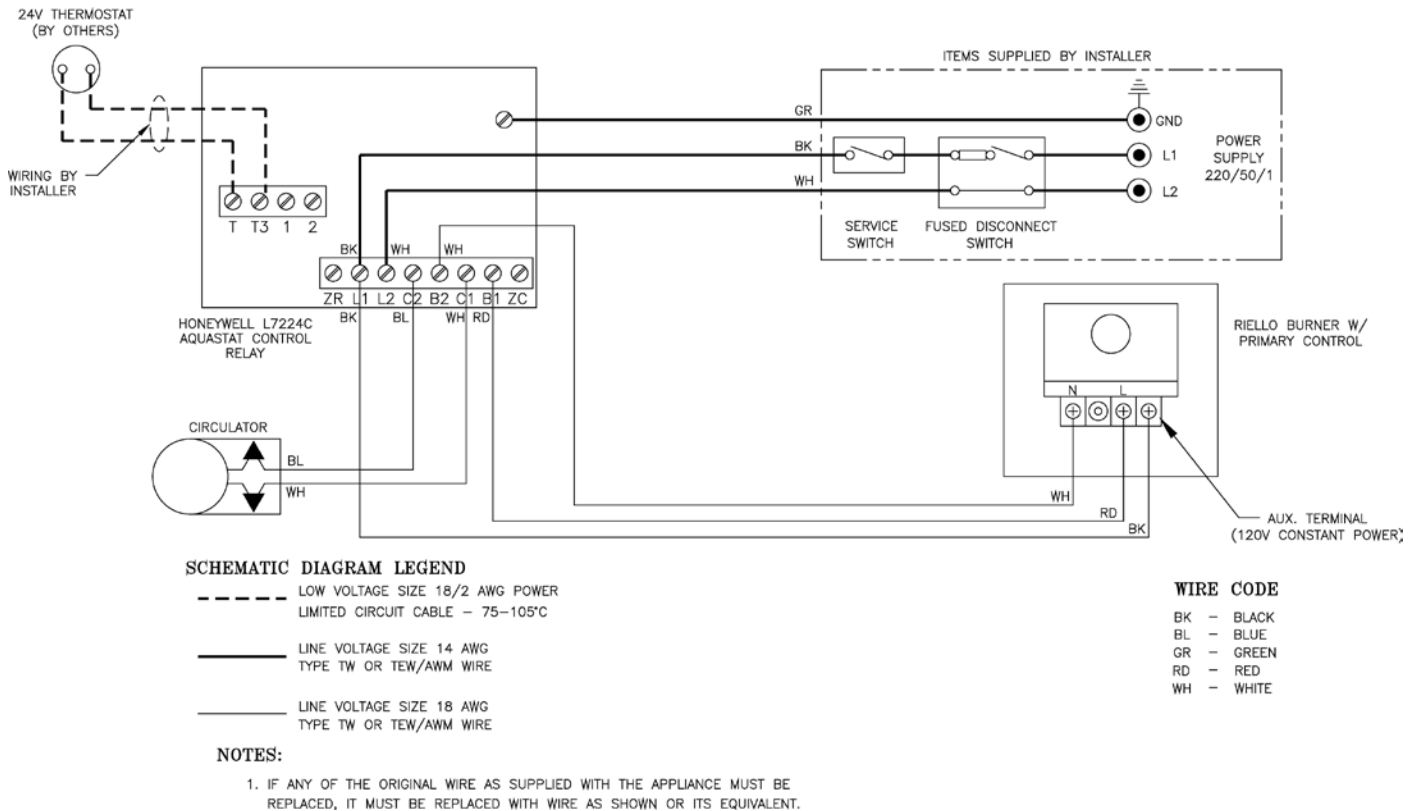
A: AP-U Boiler Wiring with Tankless, Single Circulator w/Riello Burner
